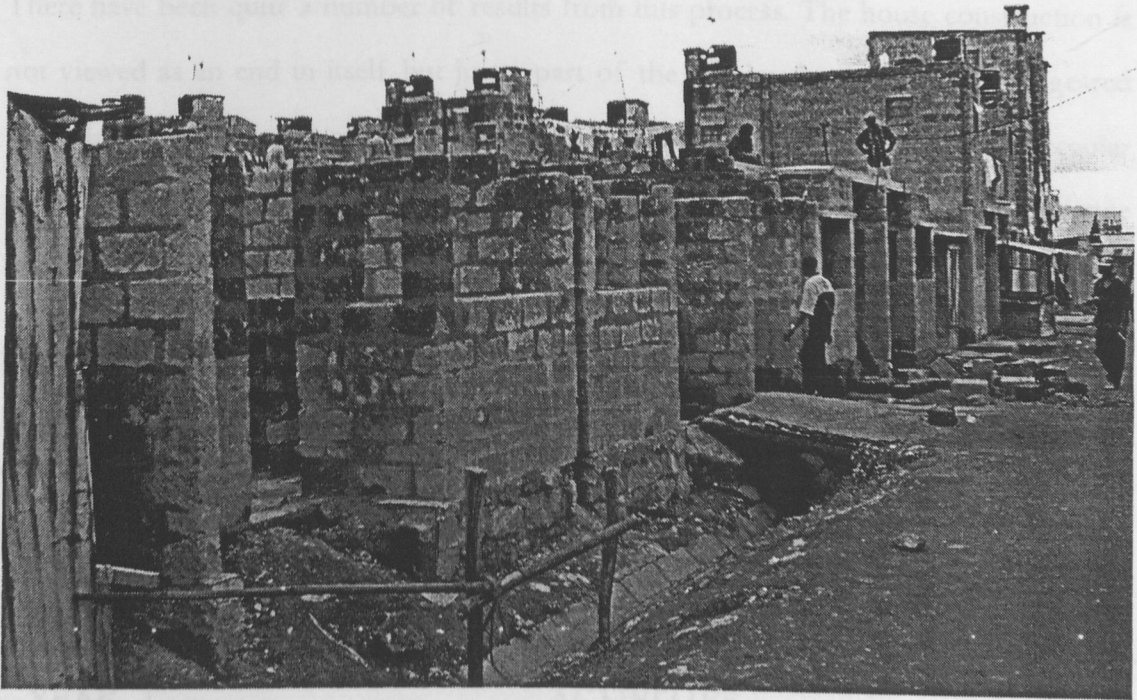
The emerging street front with the houses under construction others completed and occupied
